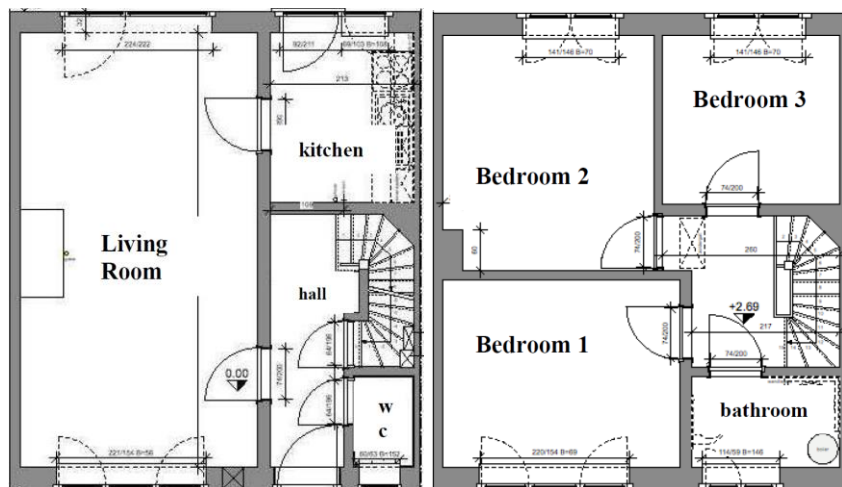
floor plans: living area on ground floor, sleeping area on first floor
